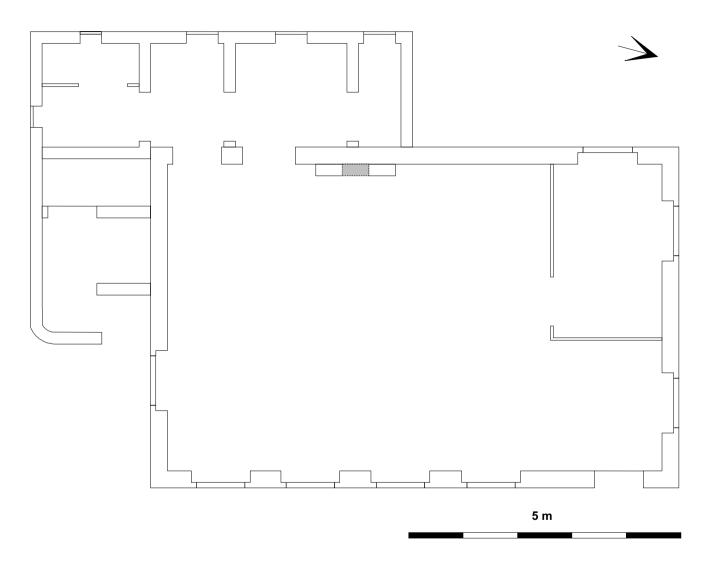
Ground plan of extant building on McConnell Drive. (not all measurements to scale as some parts of building were inaccessible)
